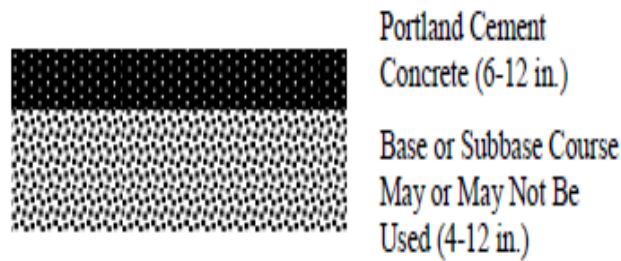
Typical Cross Section for Rigid Pavement (Huang, 2004)
